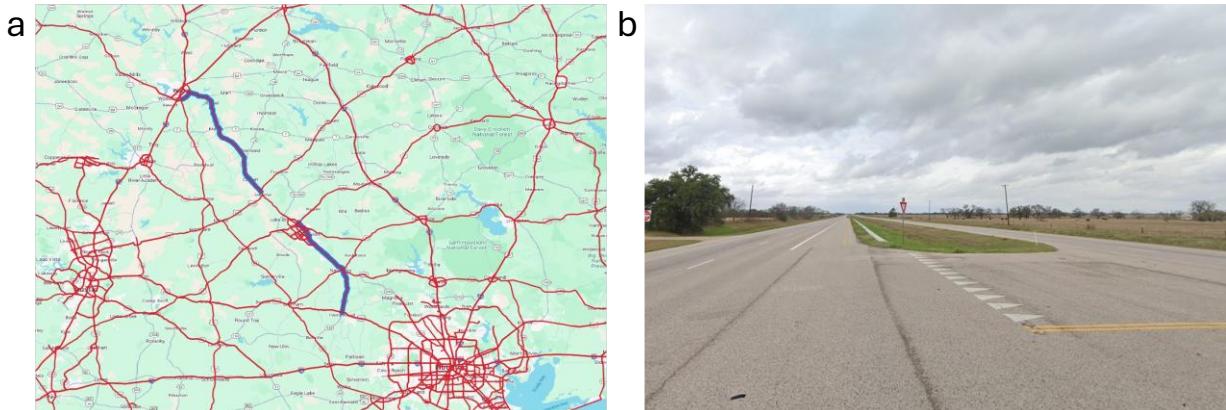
SH0006—Waco to Bryan/College Station Case Study: (a) Location and (b) Typical Pavement Surface View.
